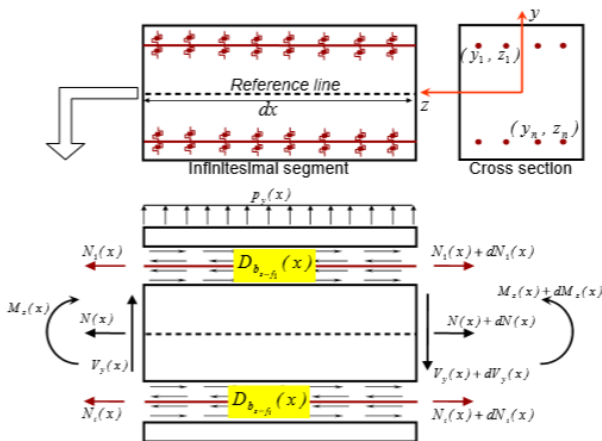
A length(dx) of beam-column element with bond consideration between concrete and reinforcing steel
